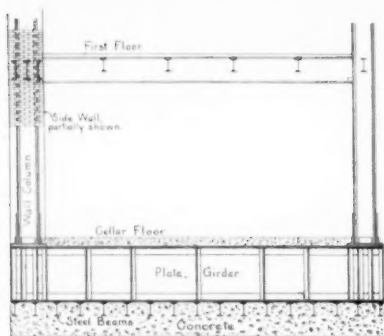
The steel grillage foundation, designed for a high office building resting on quick sand.
